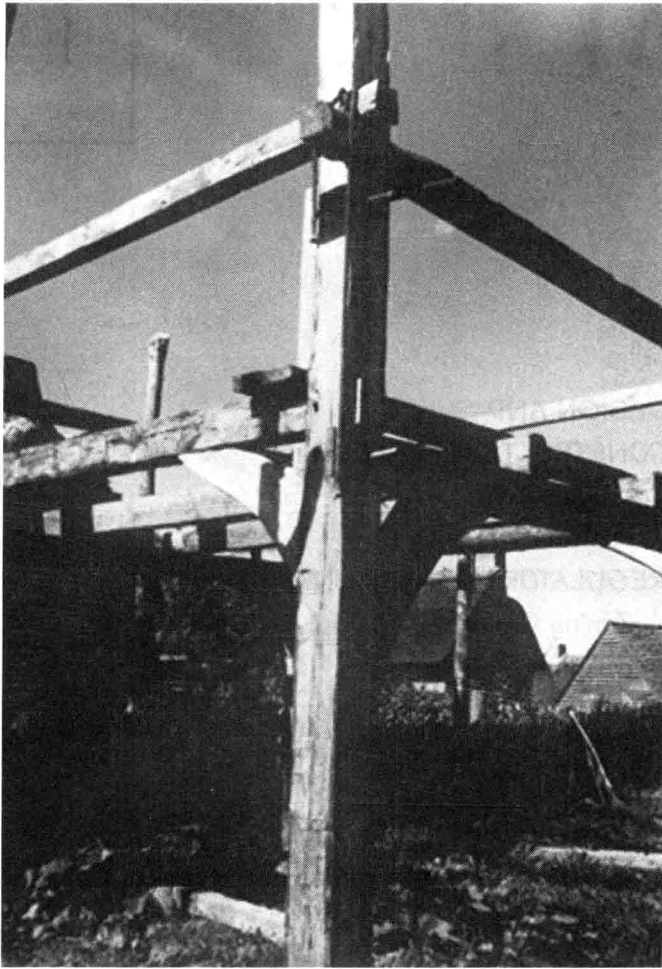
Framing in colonial America was a skilled craft brought over from Europe. Trees were felled on site and hand hewn into timbers. Wood joints instead of nails were used to join timbers. (Photo of Sturbridge Village, MA by author.)
